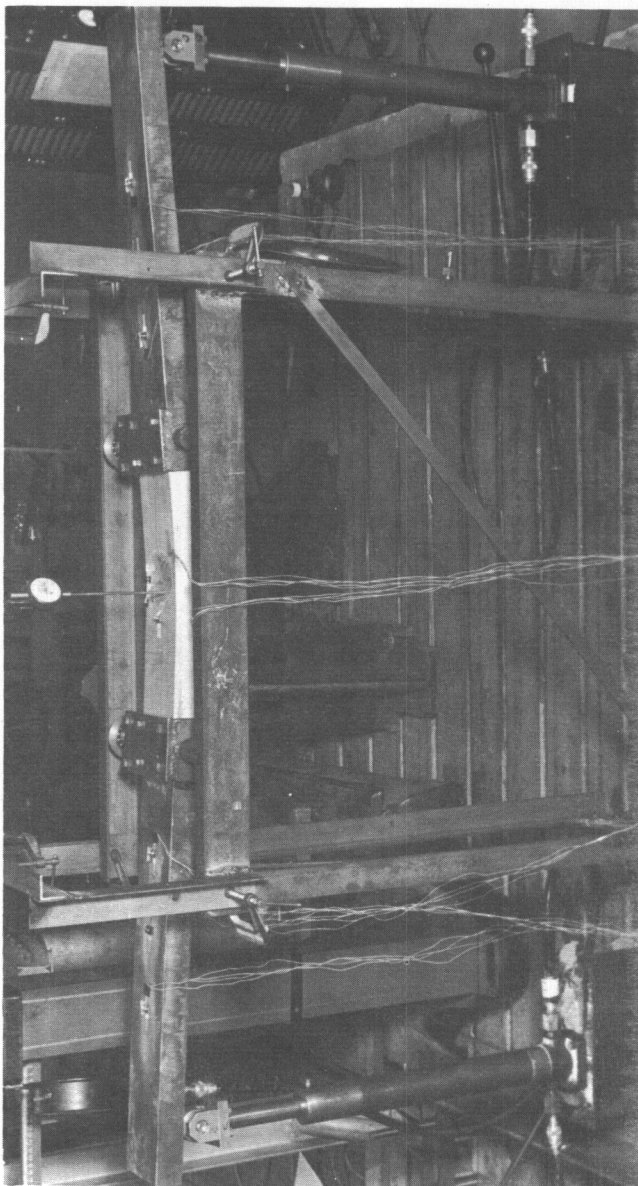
COMBINED LOADING TEST ARRANGEMENT
